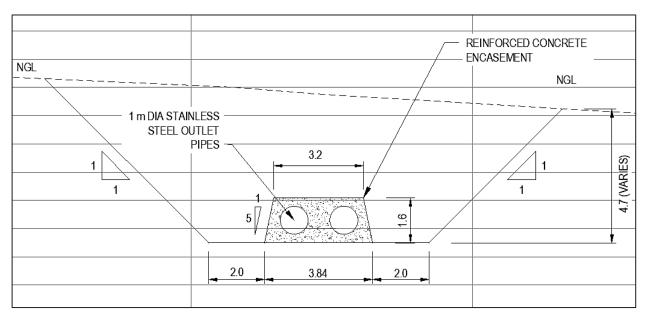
Cross-section of the outlet pipe encasement through the embankment
